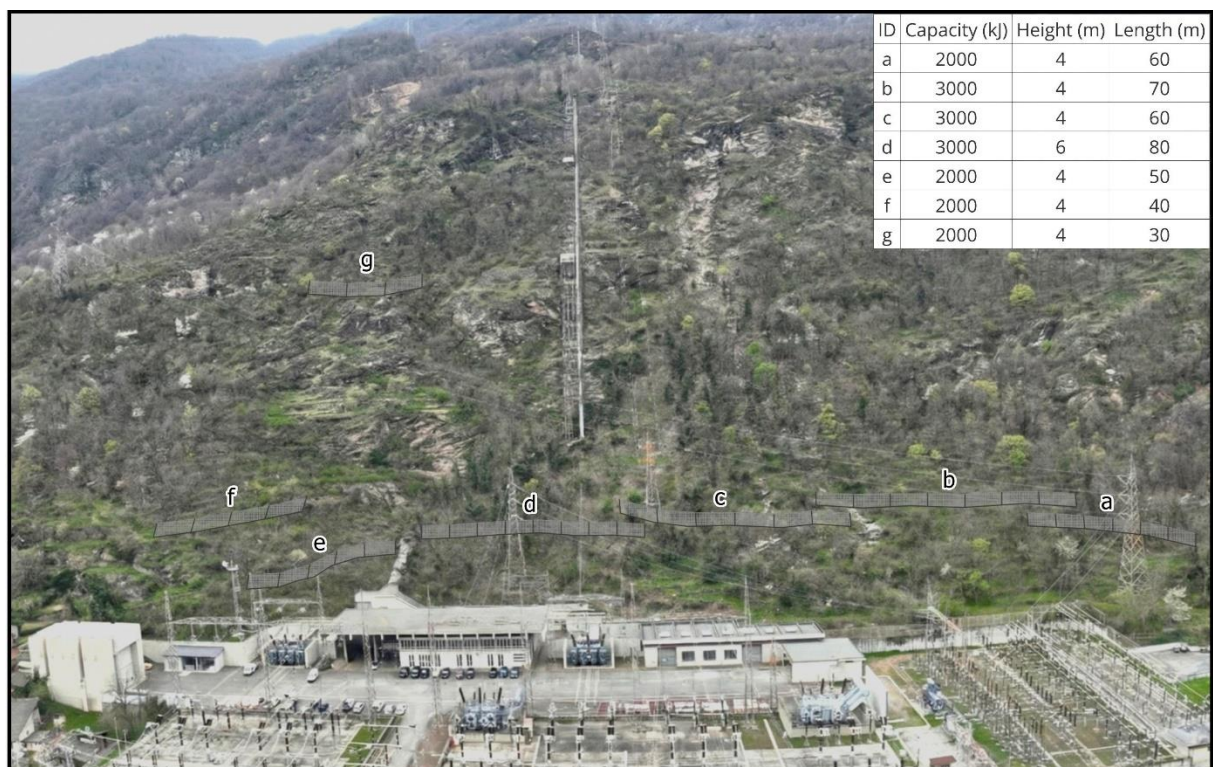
Rendering of the proposed rockfall barriers on the slope.
